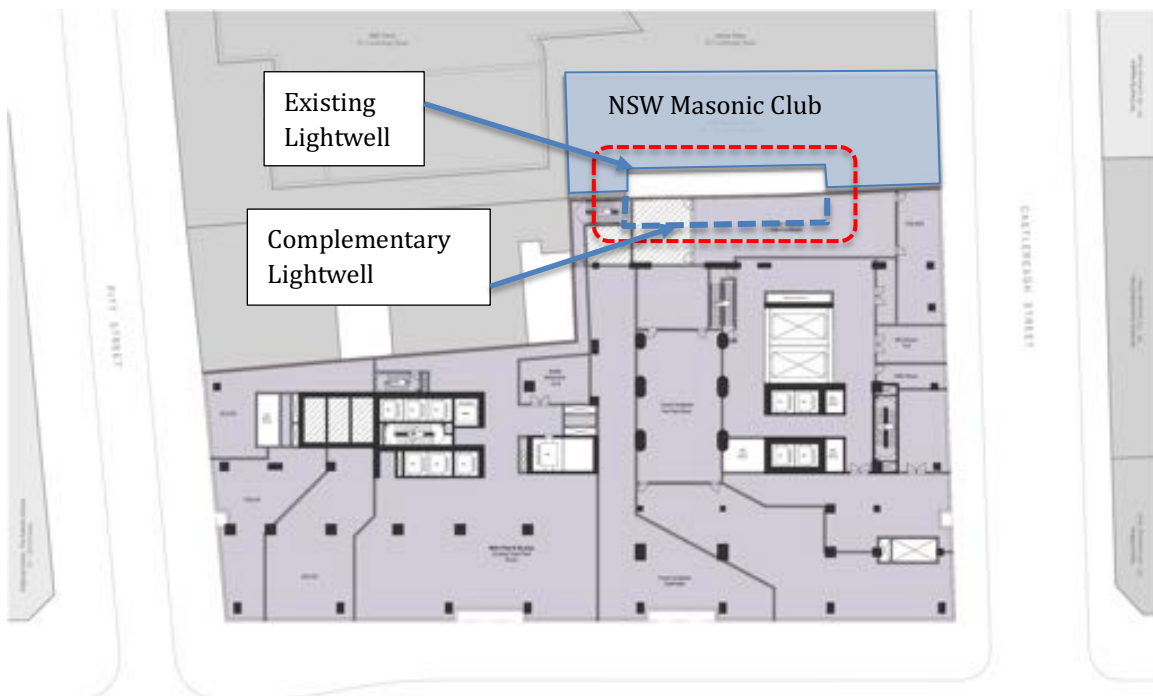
Indicative Scheme Drawings – Level 4 plan- Pitt St. North OSD. NSW Masonic Club indicated with blue outline. *Pitt Street North OSD Concept Application. Appendix F-Built Form and Urban Design Report. Architectus. 2018.
